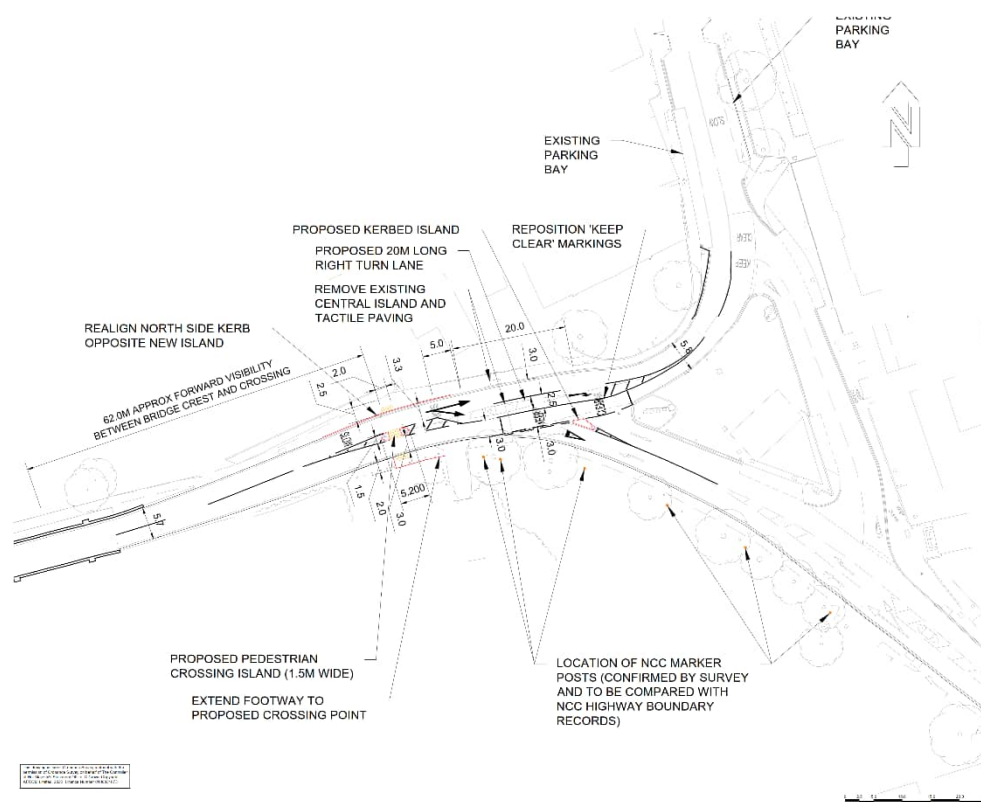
B1150 Norwich Road Proposed Infrastructure Change Layout
